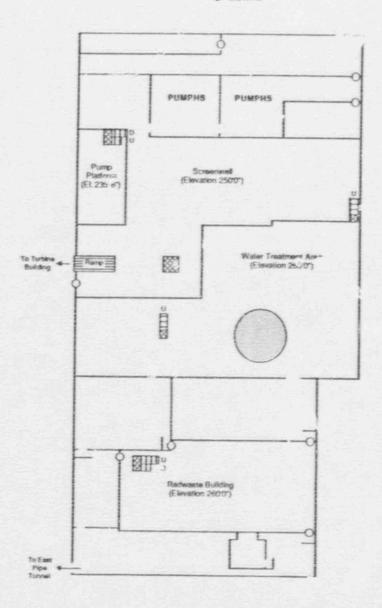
Screenwell and Water Treatment Building, Elevations 235'6" and 260'0", and Radwaste Building, Elevation 250'0"
